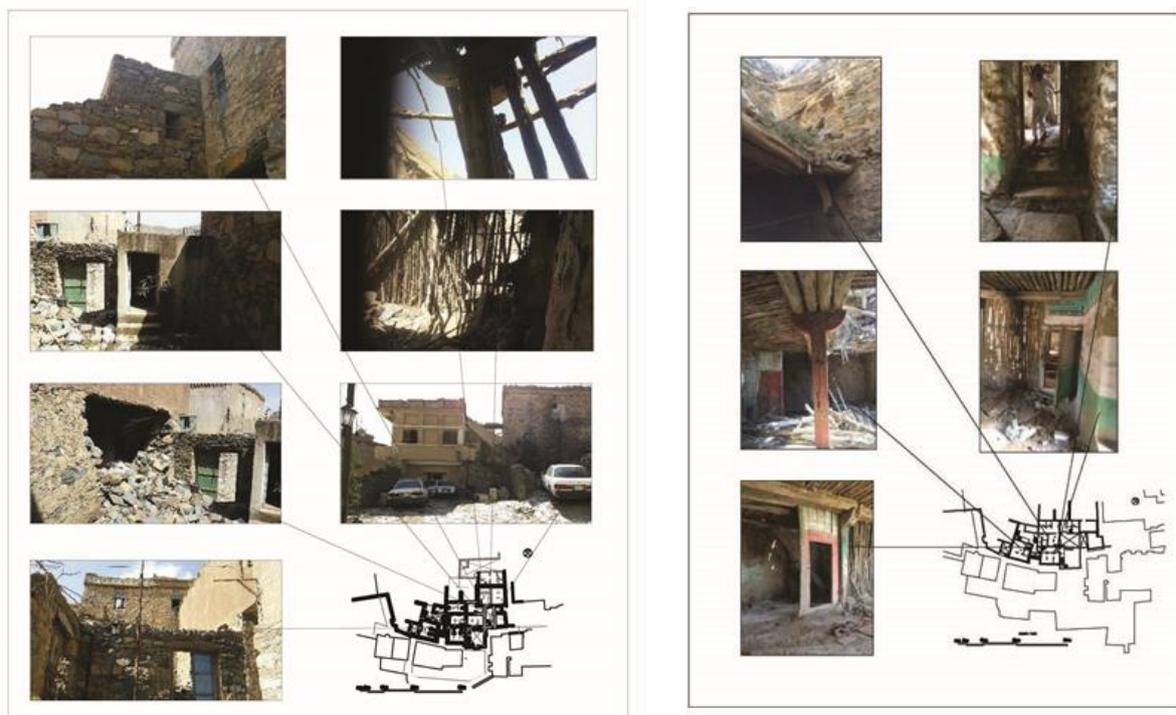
A visual documentation of Al Emarah building from inside and outside (Author, 2024)
